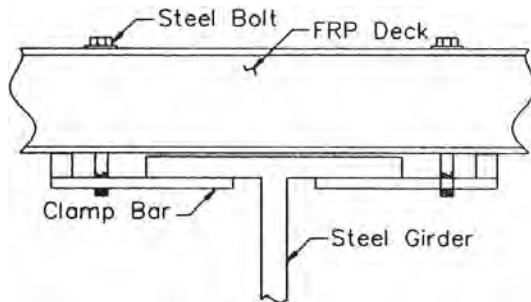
Cross section of girder and clamped connection [RBD04]
